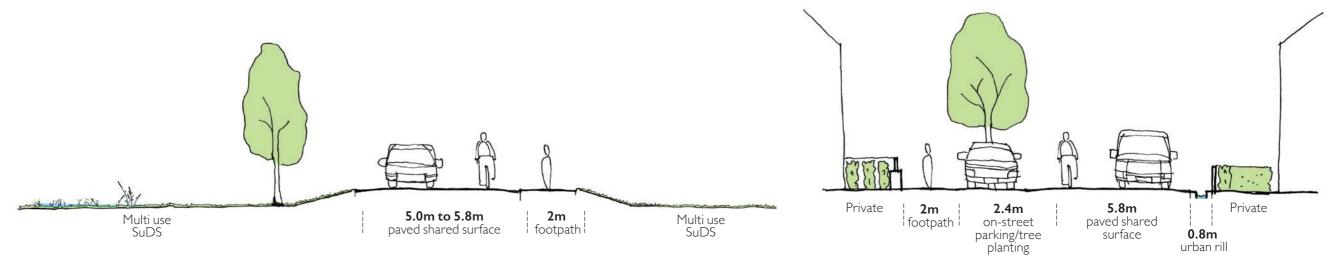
Illustrative Tertiary Street section linking through flood plain
